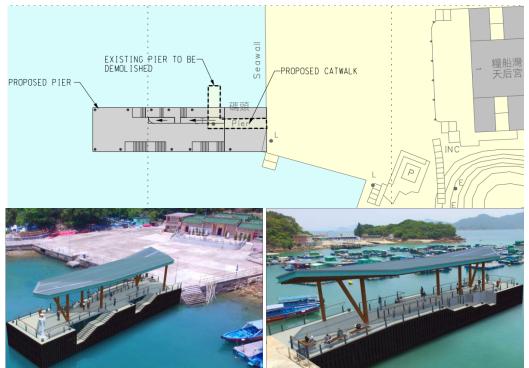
Layout and Photomontages of Proposed Leung Shuen Wan Pier
